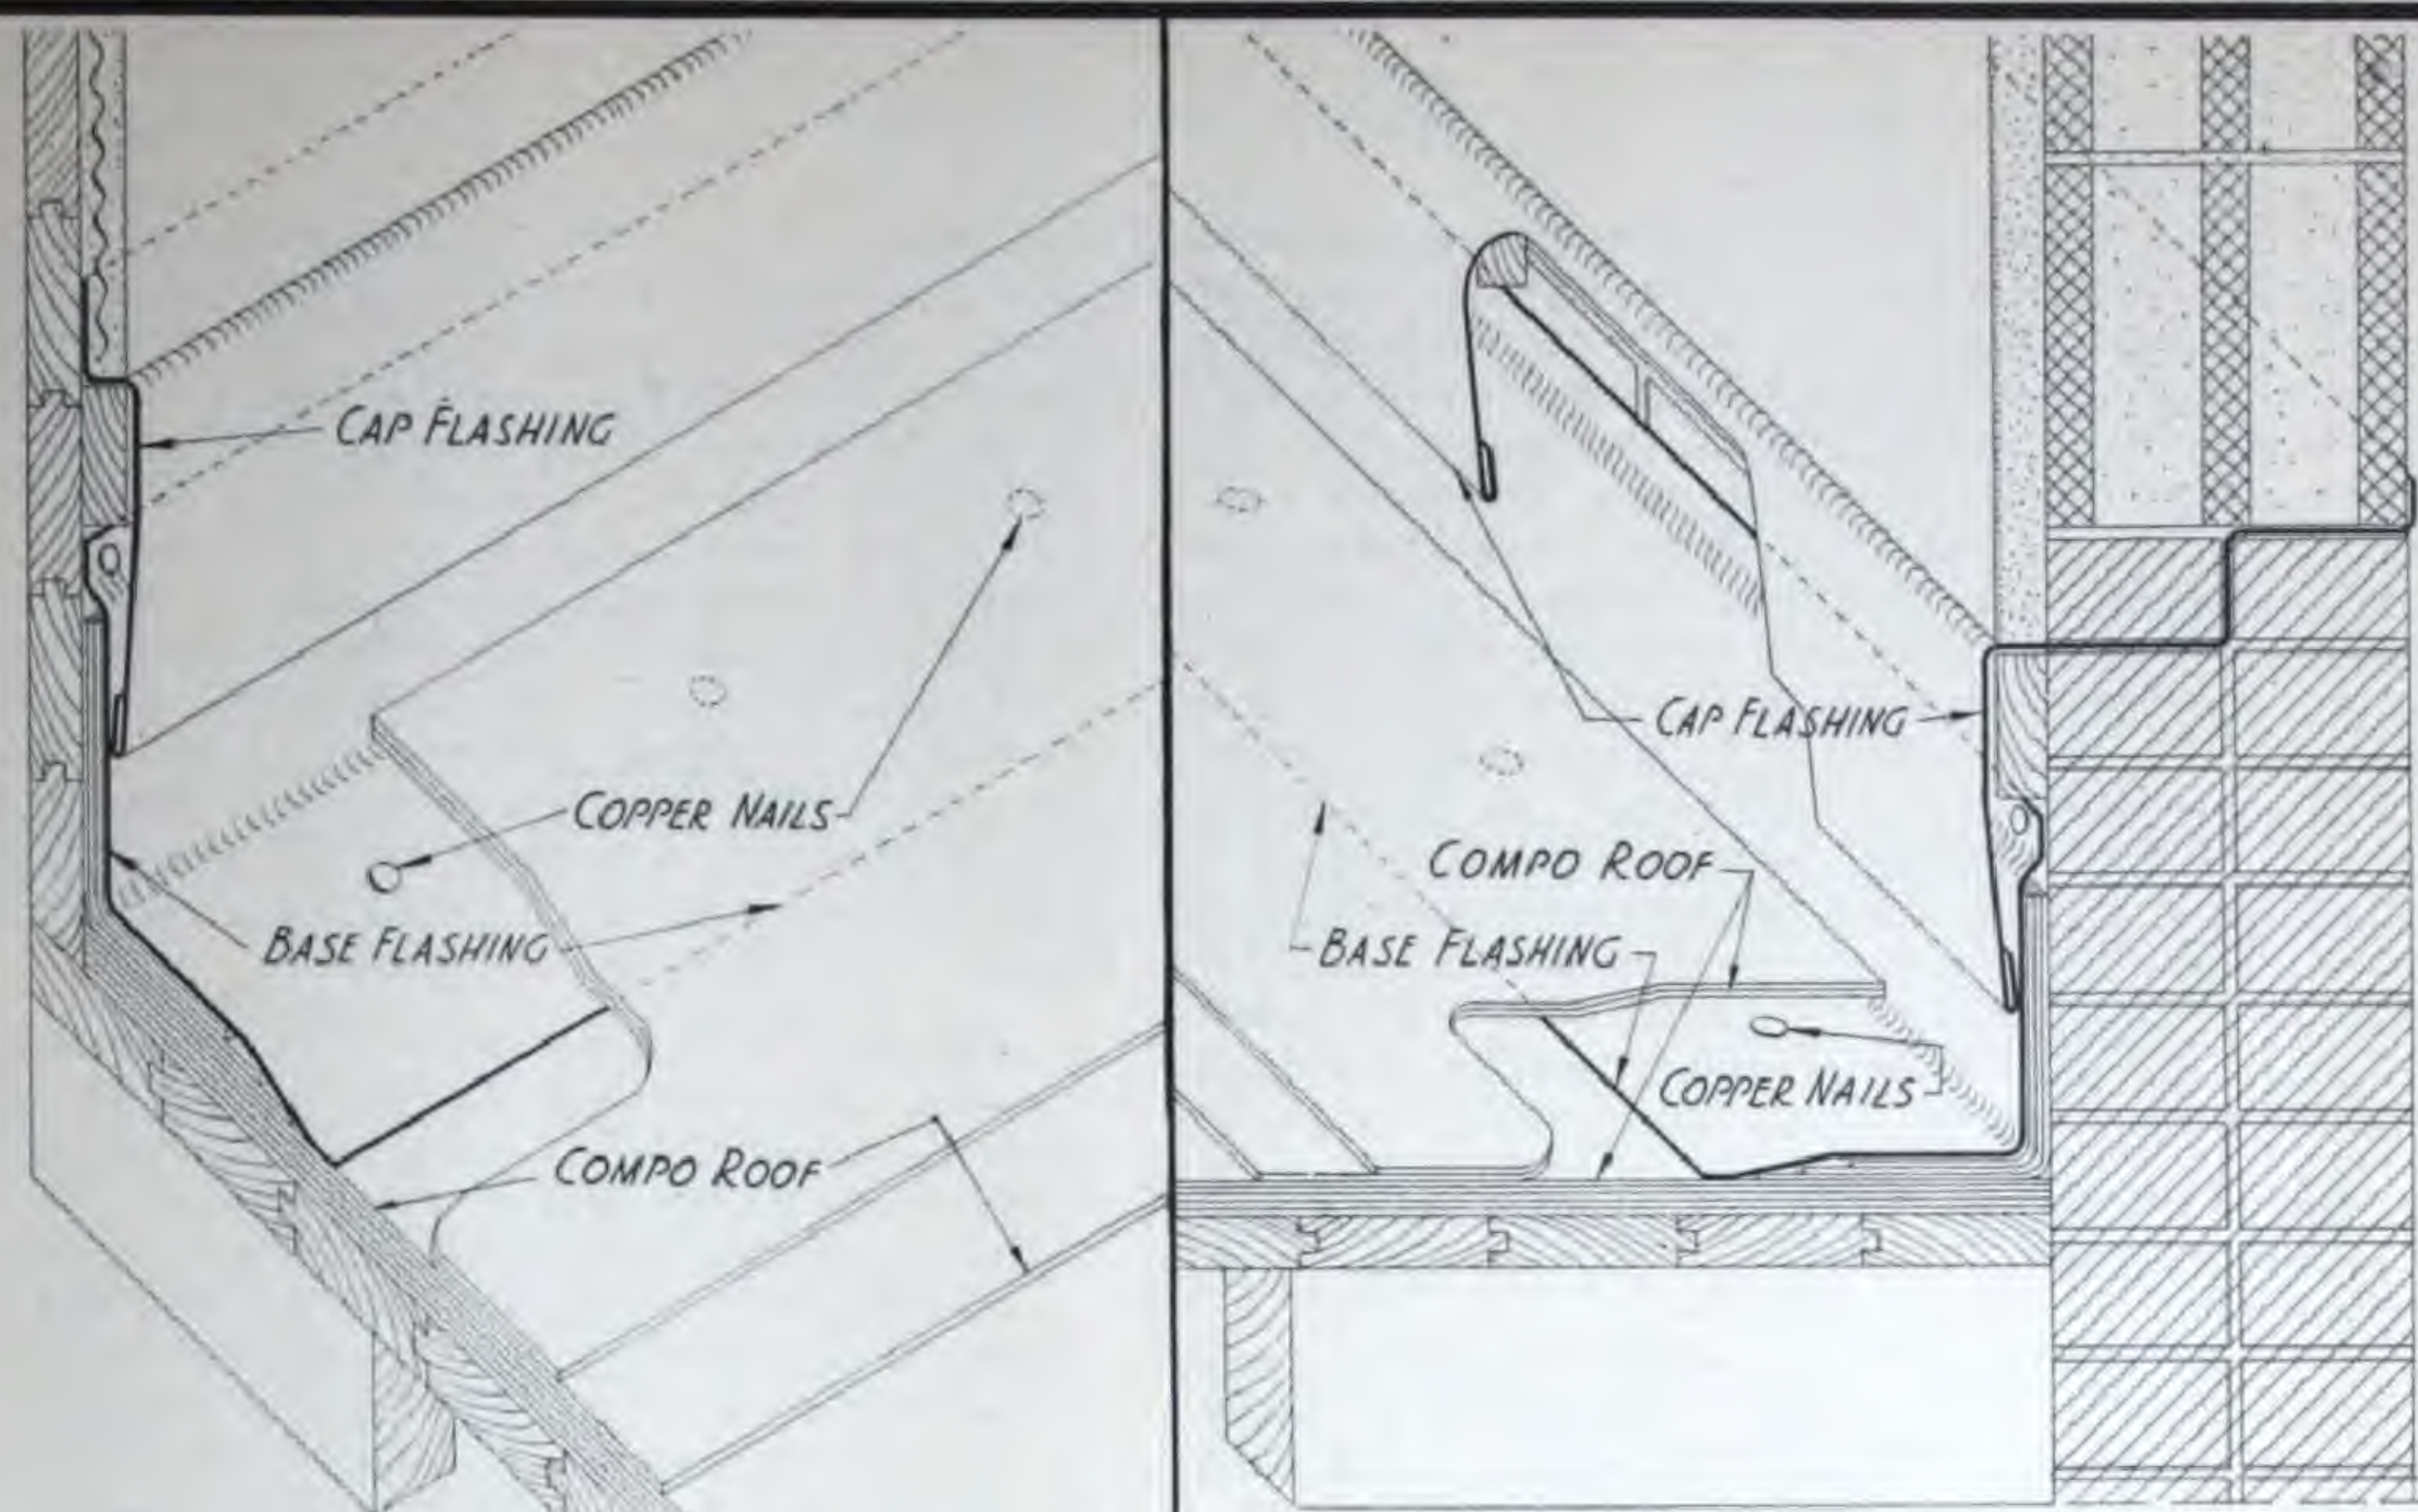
shows method of flashing a set back in fire-proof construction where the deck is covered with a composition roof. The junction of the roof surface and the upper wall must be flashed fully, not only against snow in northern climates, but because it virtually is impossible to build masonry walls impervious to driving rains. The cap flashing is stepped up in the masonry for keying, and carried through the wall to cut off water. The base flashing is placed as in Fig. 78, and is lapped at least 4" by the cap flashing. For description of reglet construction see page 70. The cross seams of the outer cap should be soldered flat-locks, held with cleats. An alternate is a loose-lock seam instead of the cap and base.
